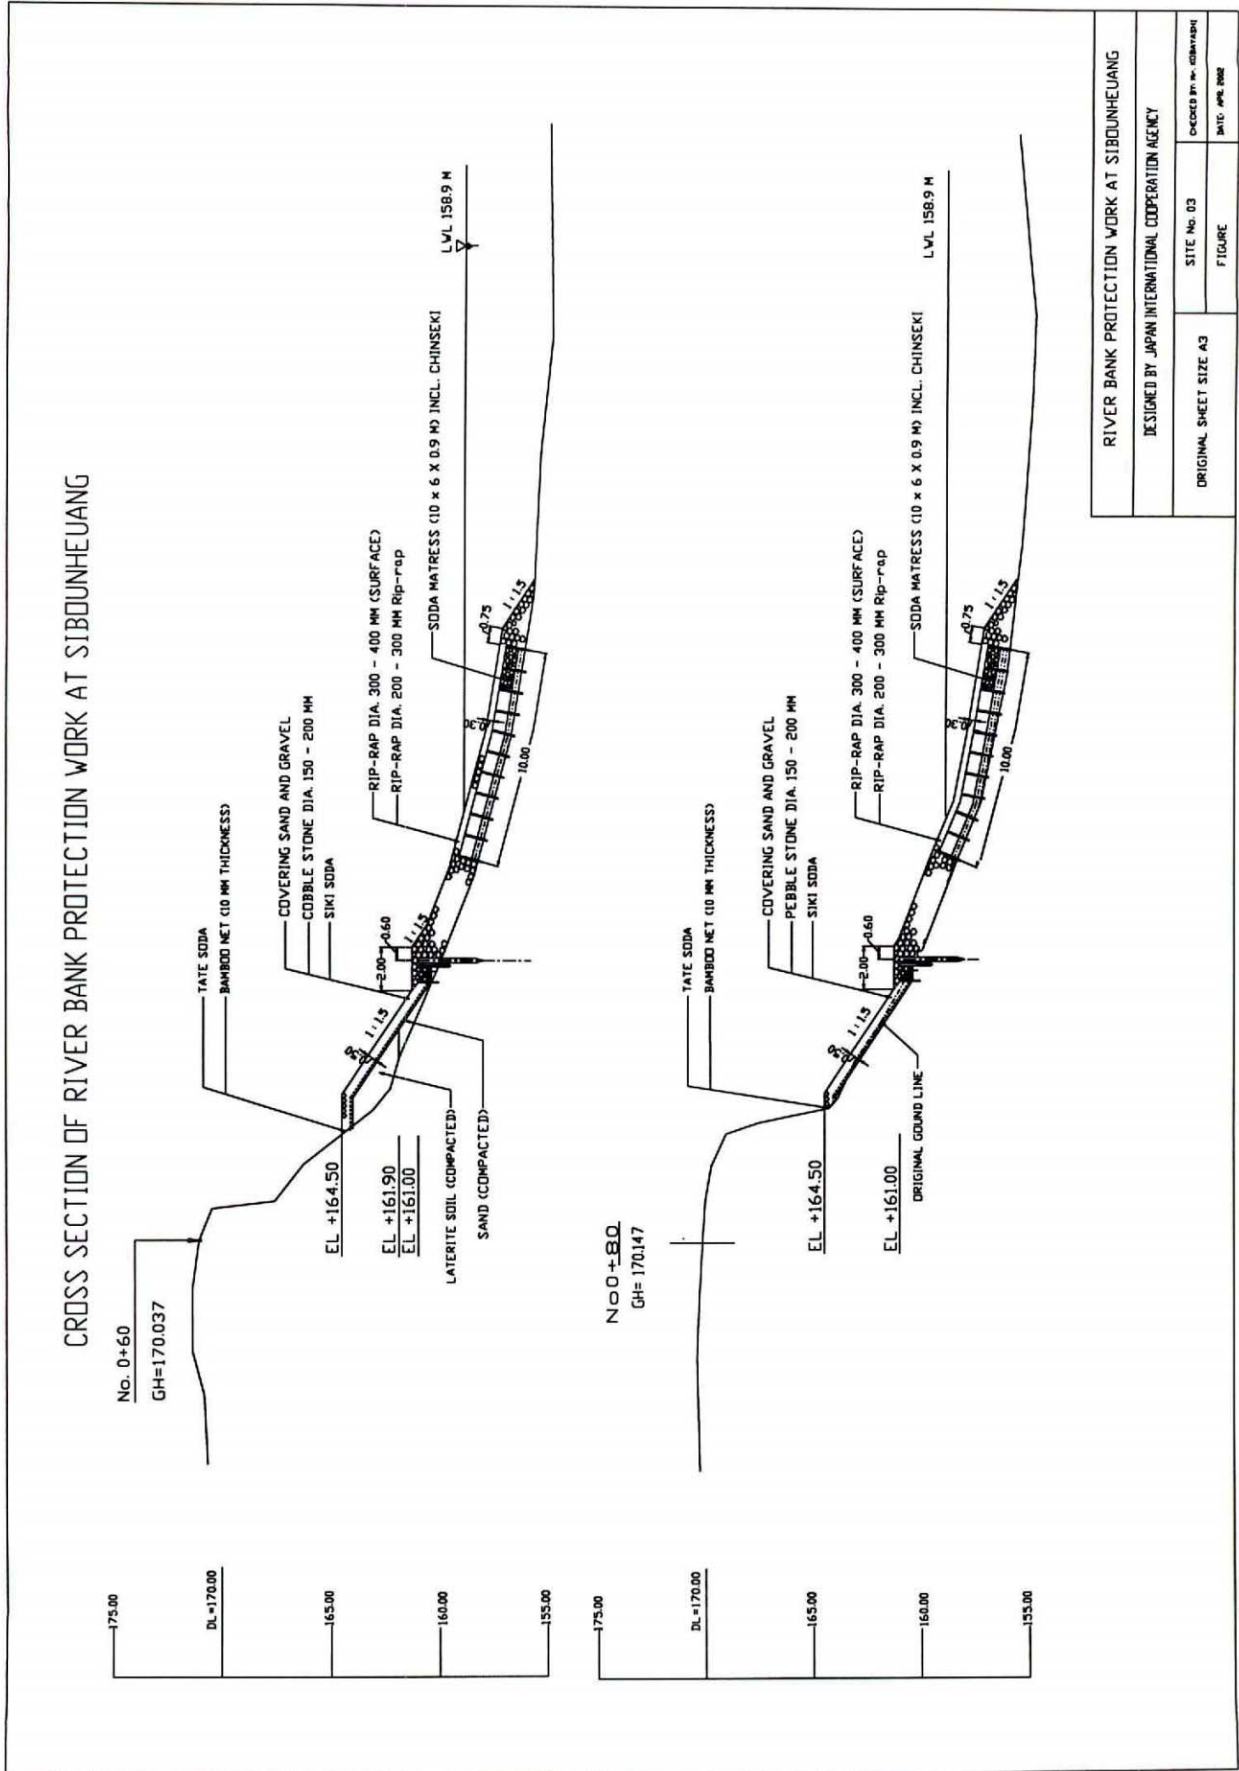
(1/5) Cross Section of River Bank Protection Work at Sibounheuang Site
